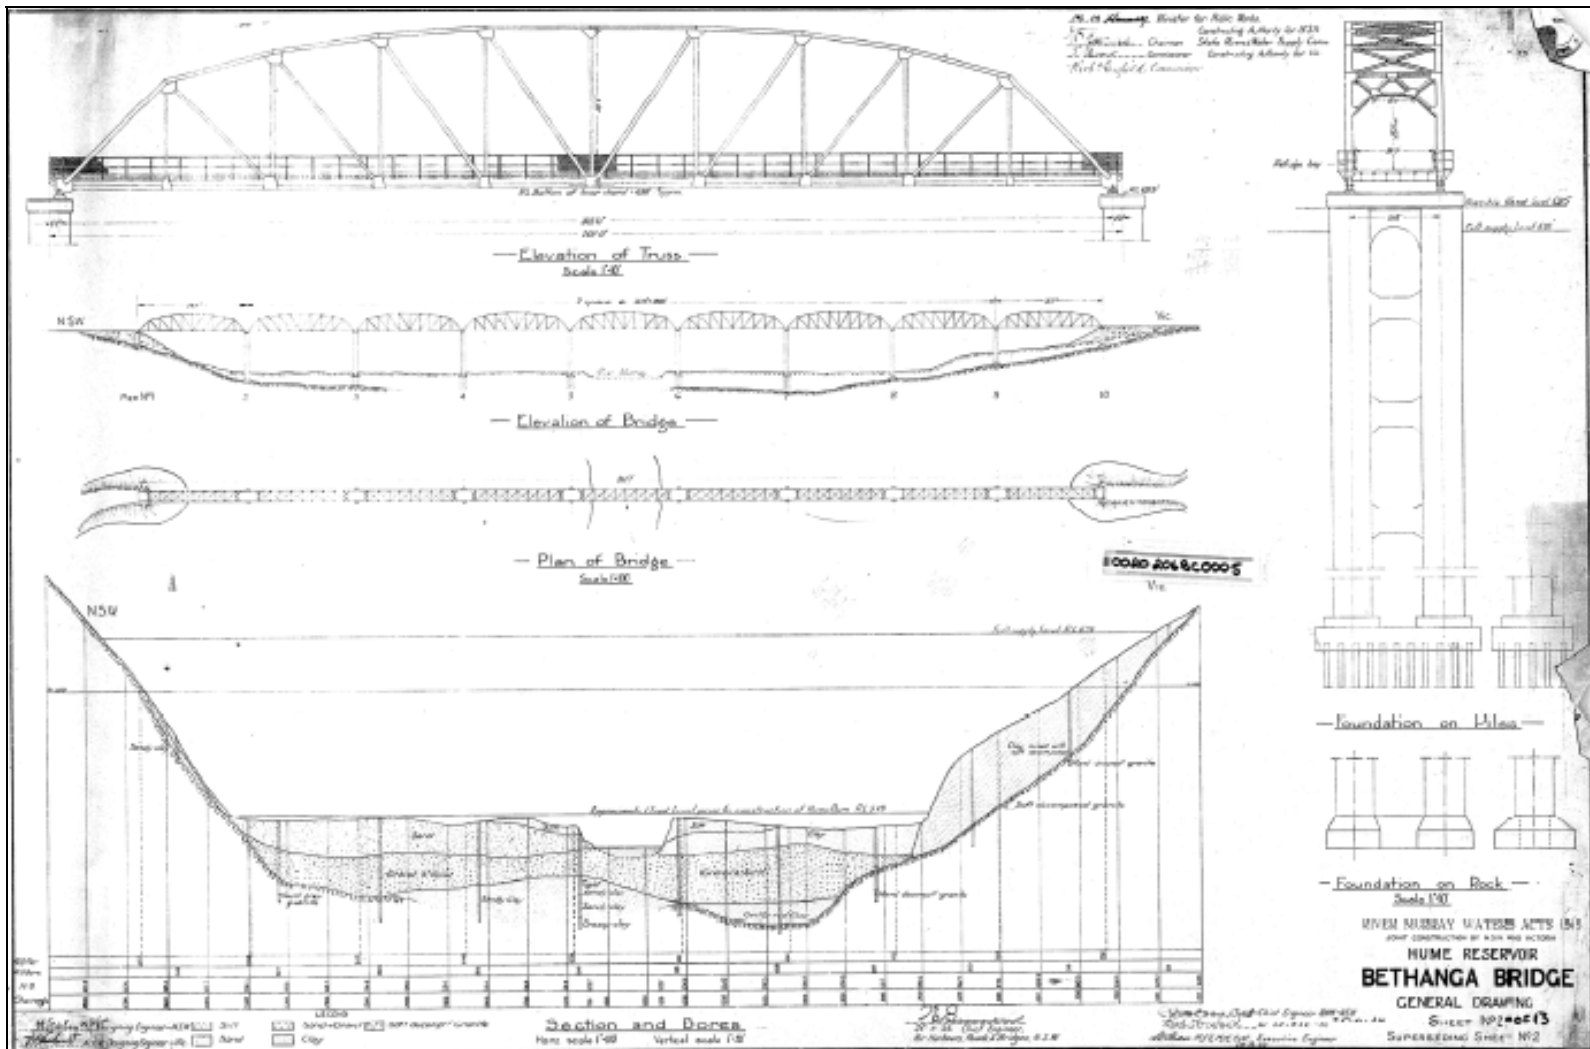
Overall plans of the Bethanga Bridge from the design plans (RMS Archives).
